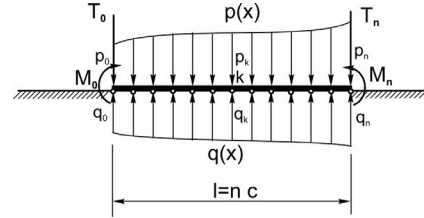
Foundation girder with ends loaded by moments and transversal forces
